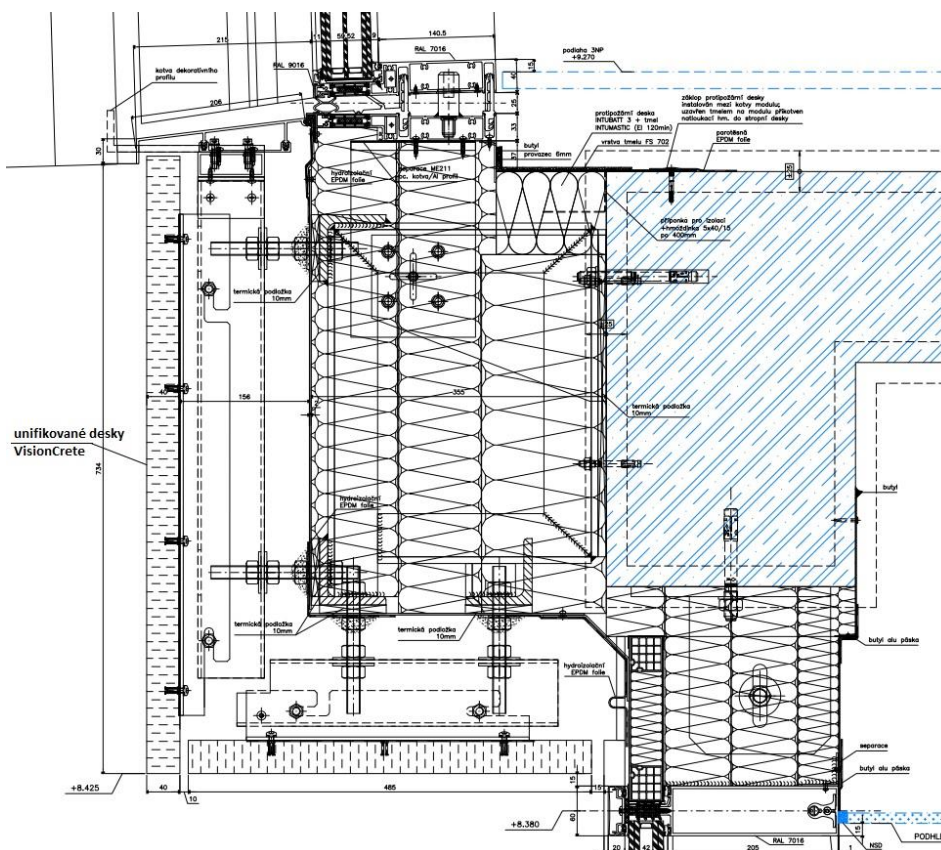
Detail - fixing of the slabs - section in contact with the ceiling slab
